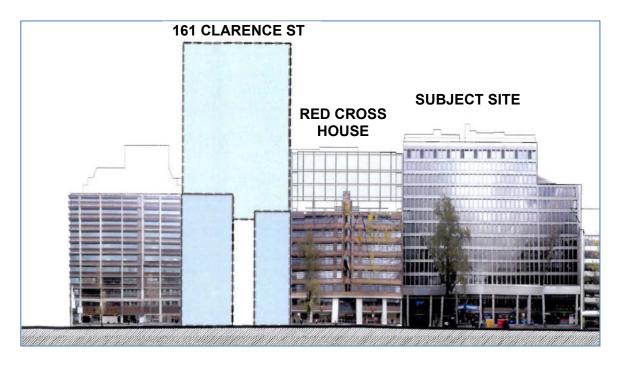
The approved building envelope for the site at 161-165 Clarence Street as viewed in its Clarence Street context.
